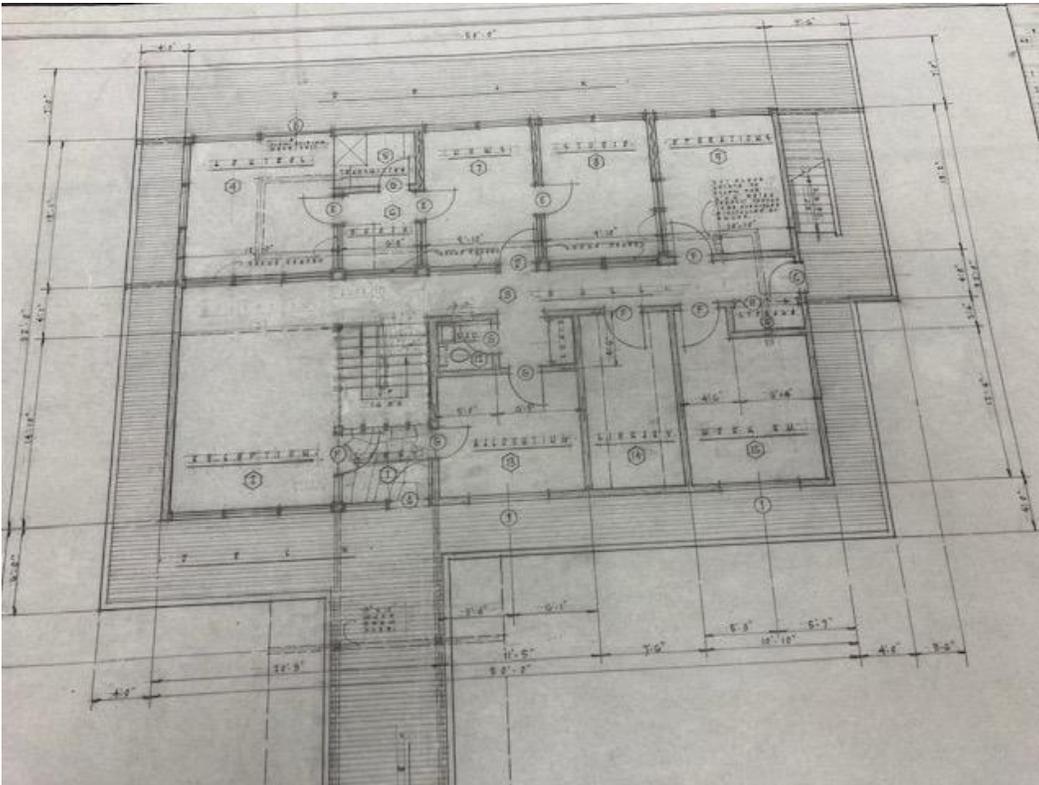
1960 architect's drawings for KGY Studio's second floor plan.
